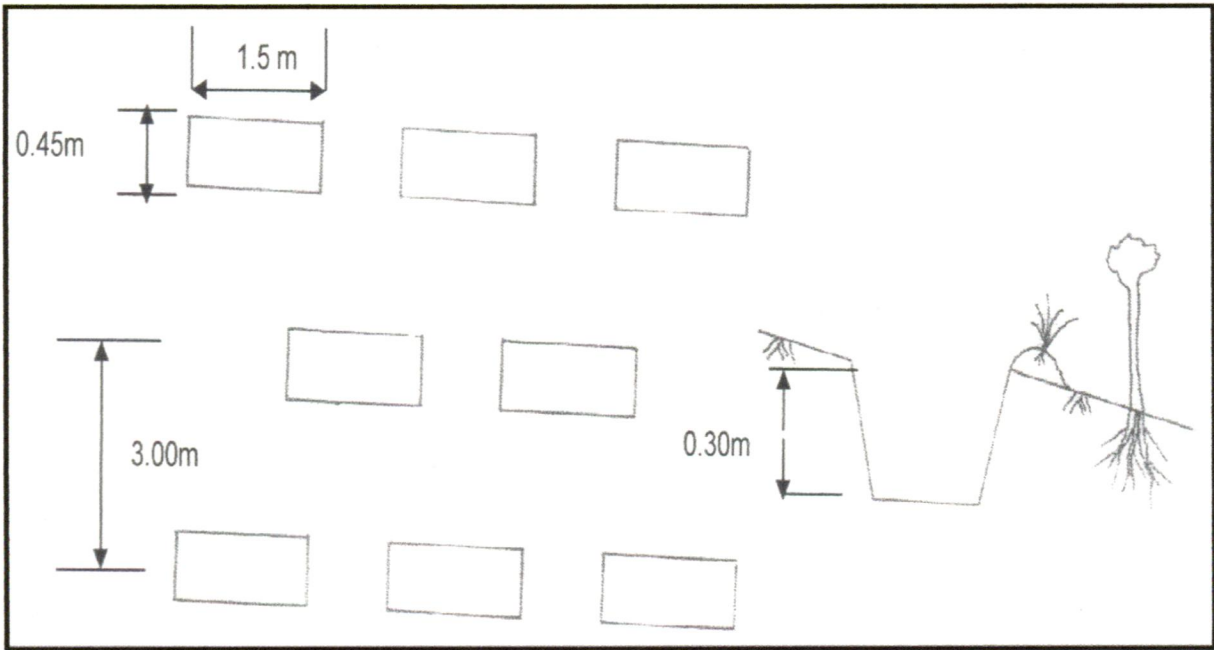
Plans and Cross Section of the Staggered Contour Trenching System
